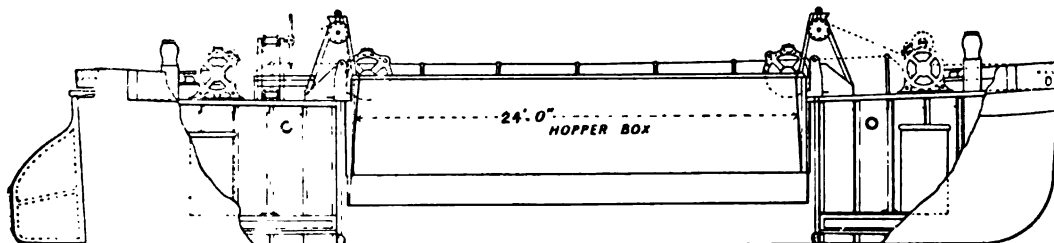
Hopper Barge for depositing 50-ton Concrete Bags (William Dyce Cay, Esq., M.I.C.E., Engineer). (Sectional Elevation.)
